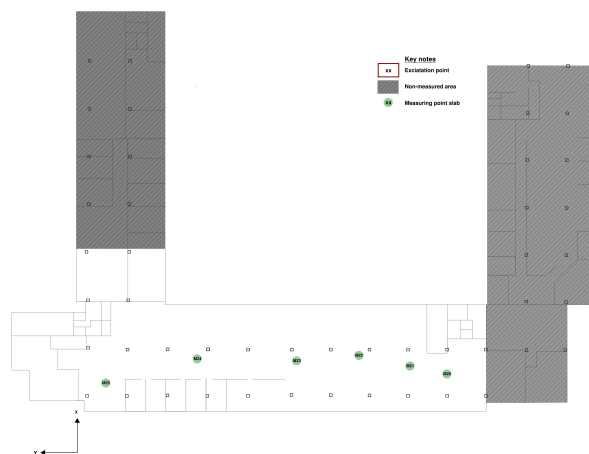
Measurement positions on slab and pillars for floors 3–5.
